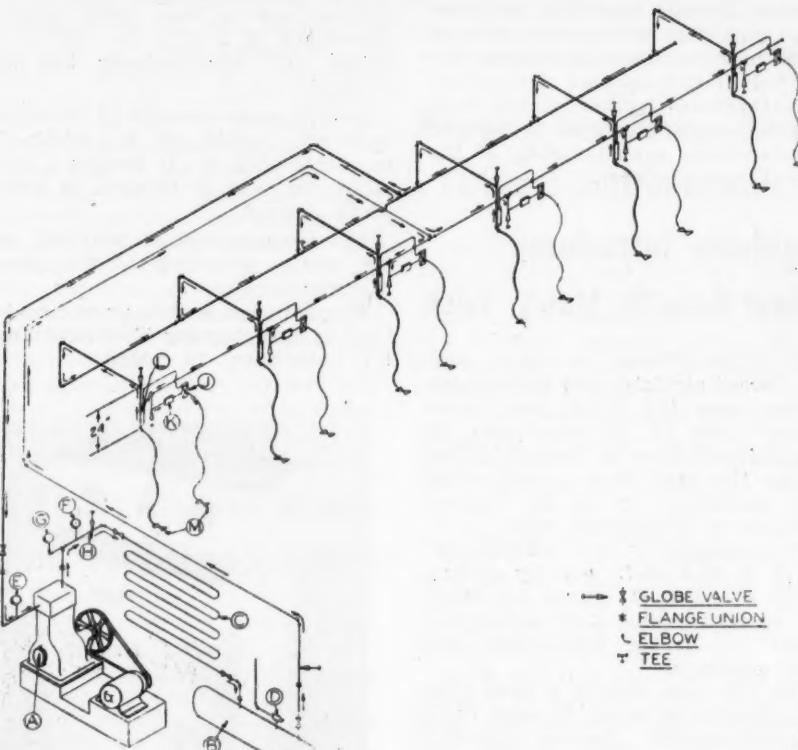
depicts a typical ammonia plant hook-up for trucks using plates. "M" shows the make-and-break connections used to connect the system to the truck.
